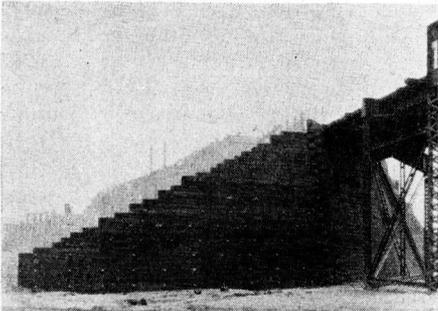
Interlocked Laminated Timber Bolted to Piles. Courtesy of Koppers Co.
